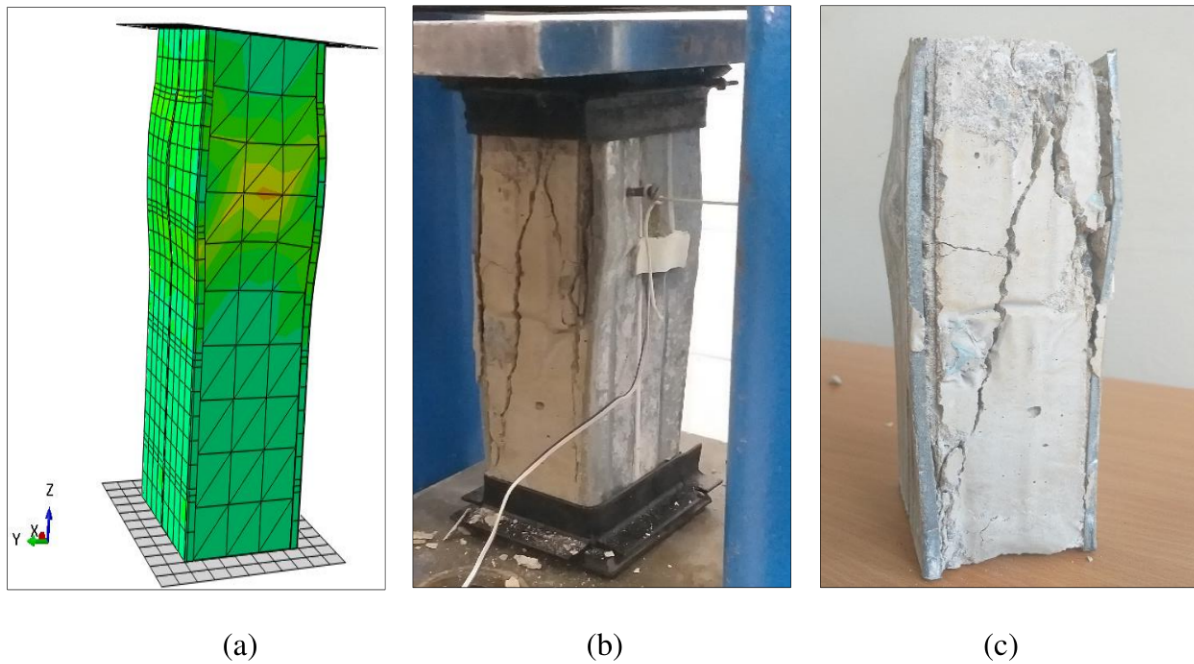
Failure mode of cold-formed steel built-up back-to-back filled with concrete column: (a) Numerical; (b) First experimental loading; (c) Loading until failure.
